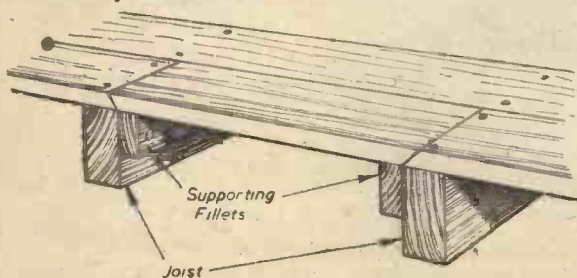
The ends of a short piece of floorboard supported on fillets screwed to the joists.
